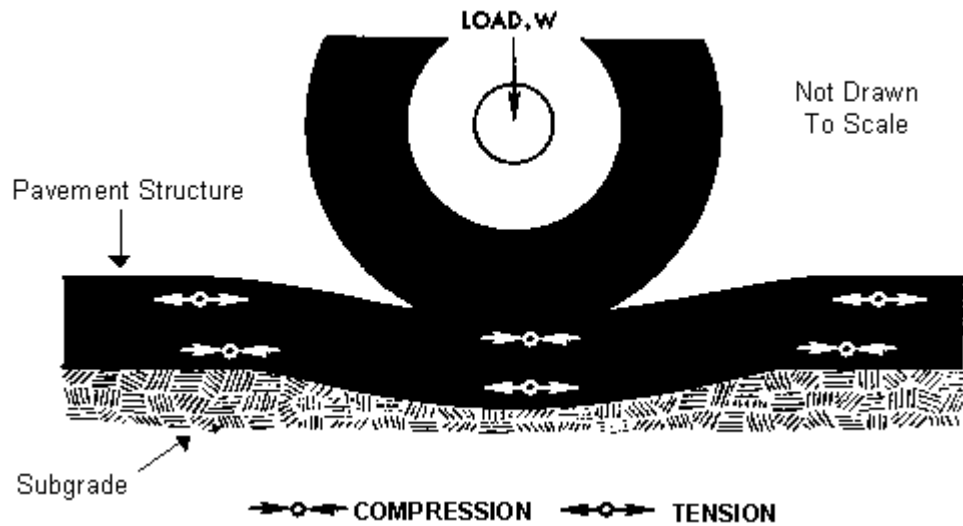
Permanent Deformation in the Flexible Pavement Structure
